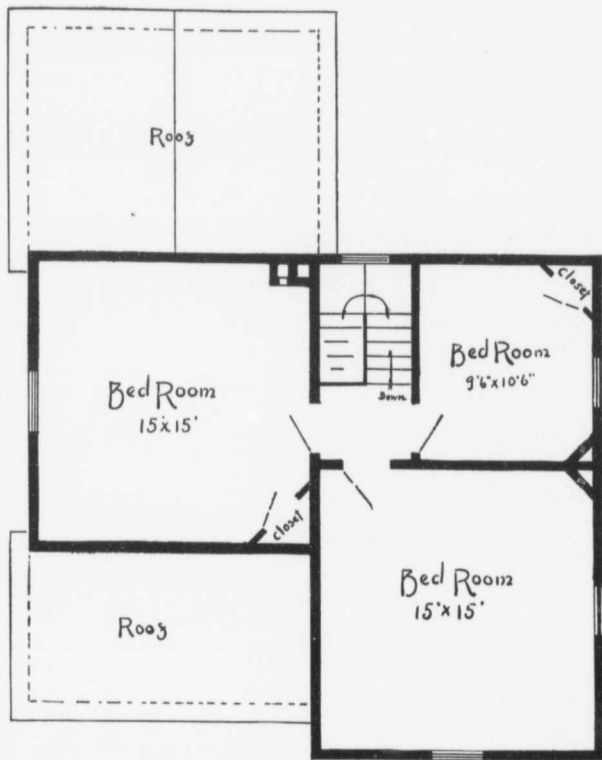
Second floor of \$600 farm house with \$500 addition. (Design No. L.)
